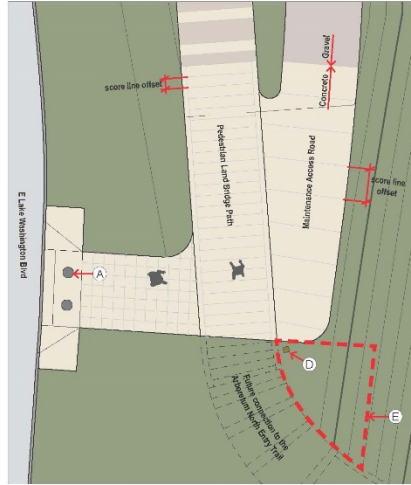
Pedestrian Land Bridge Path at stormwater maintenance access road enlarged plan
